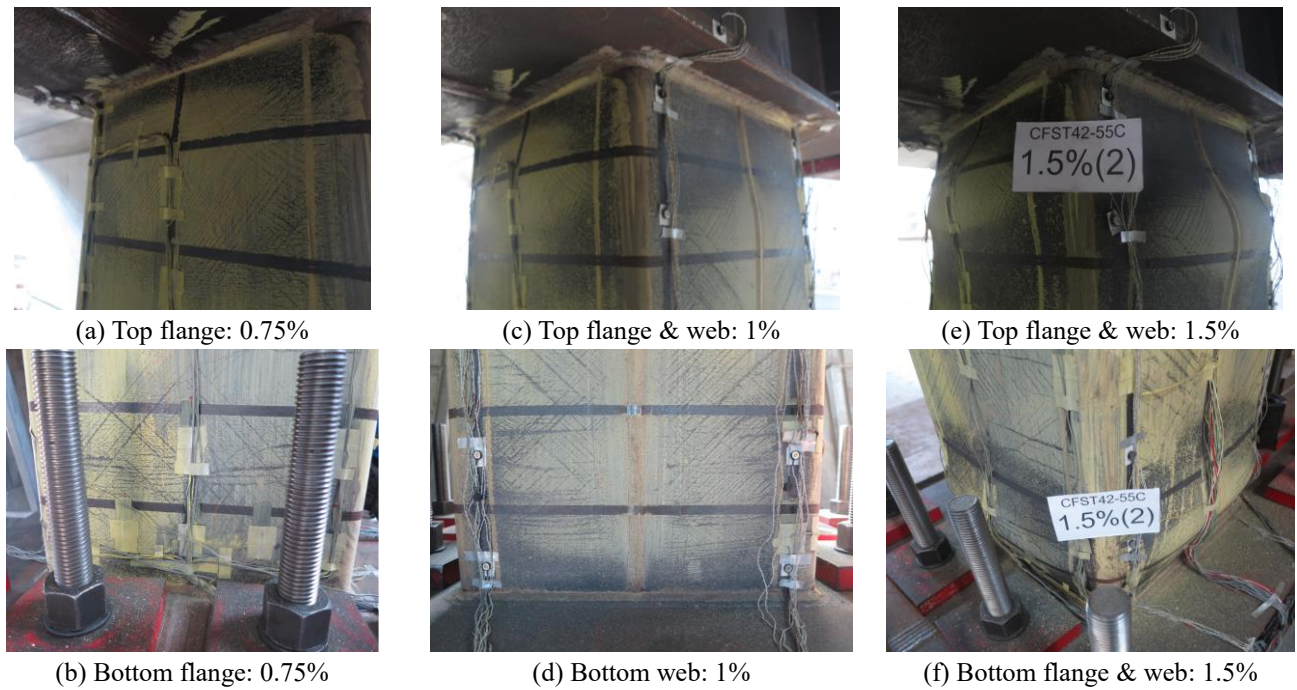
Deformation and failure stages of Specimen CFST42-55C
